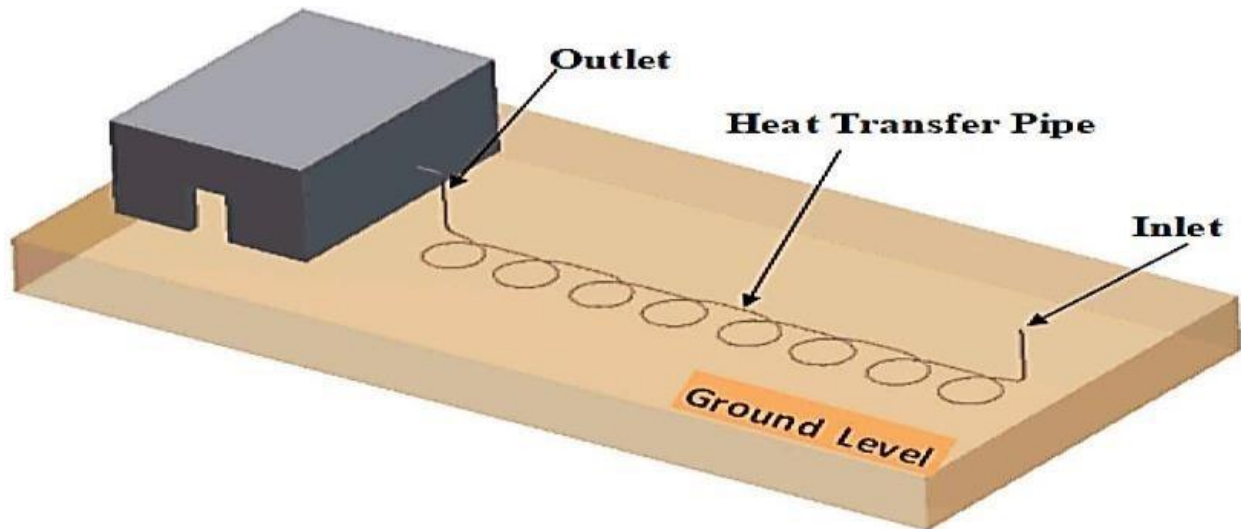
Slinky pipe-layout for GAHE system [31]
